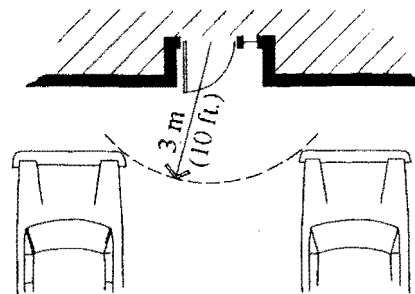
Stalls must be at least 3m (10 ft.) from building entries
